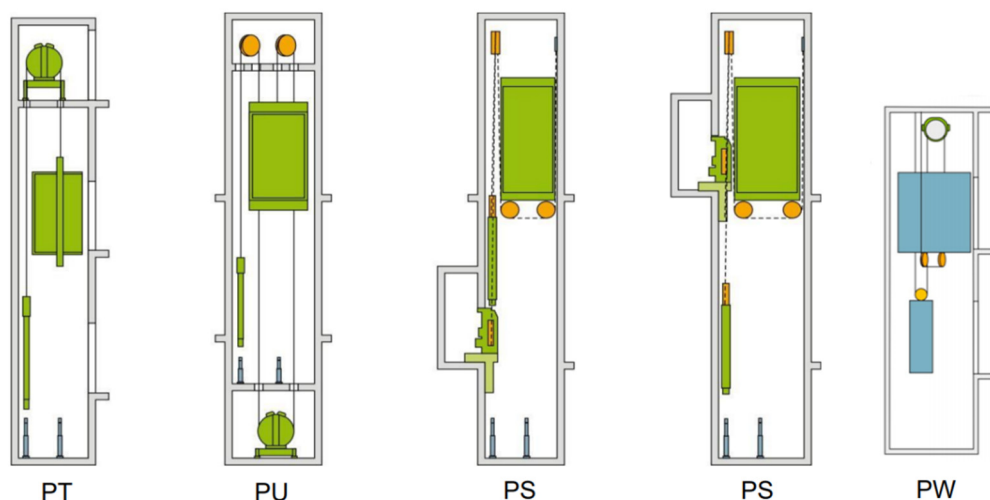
Passenger elevator types by machine room location (KONE Corporation, 2014)
